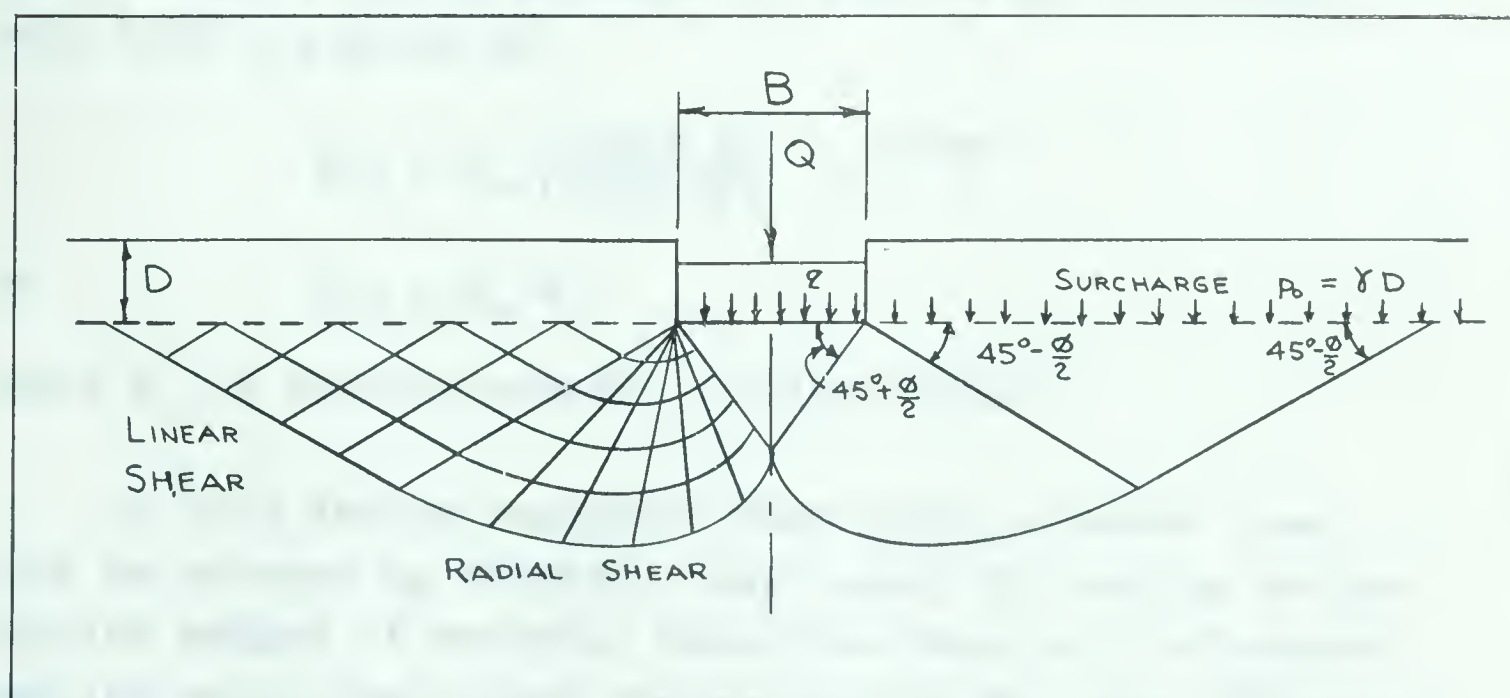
Prandtl zones of plastic equilibrium for loaded strip footing of width B .
